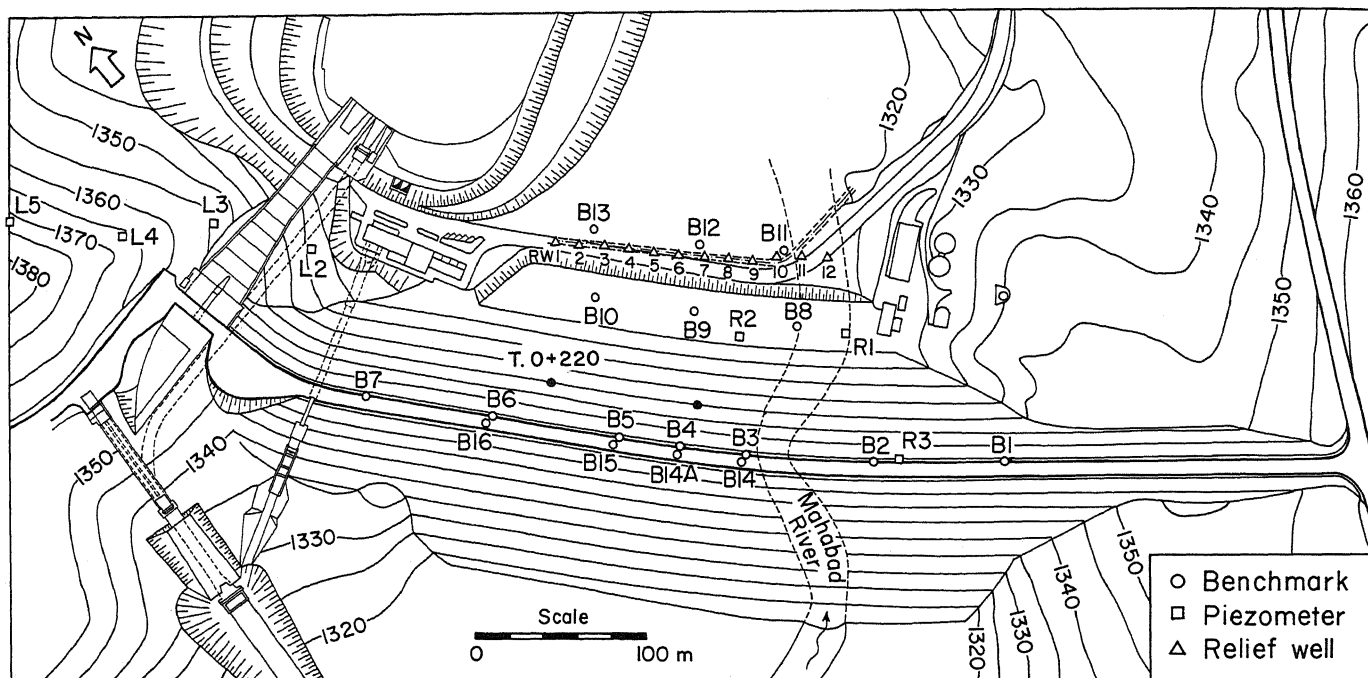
Layout of Mahabad dam showing locations of available monitoring facilities
